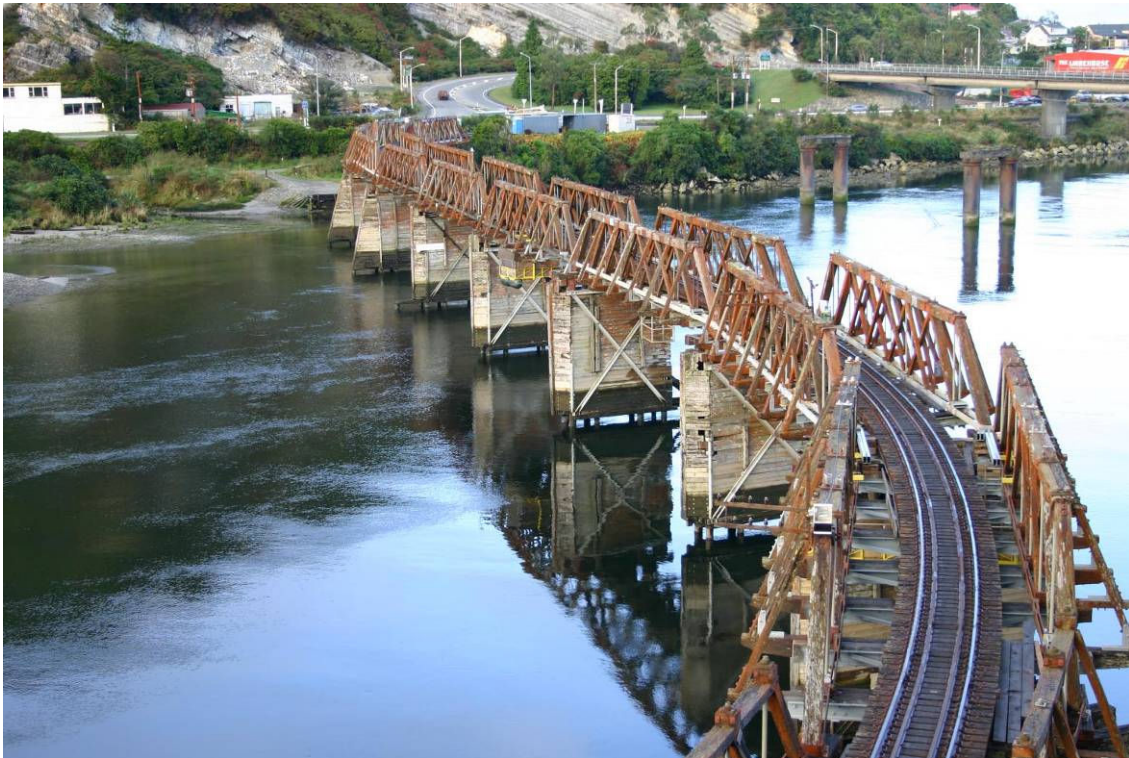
Existing Bridge 1 Rapahoe showing S-shaped alignment
